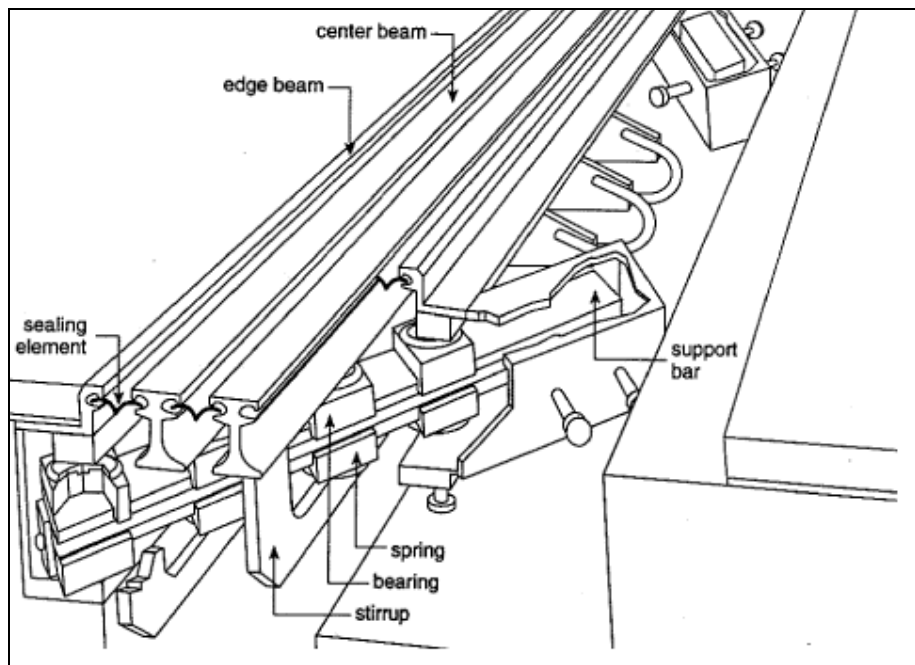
Cut-Away View of a “Swivel Joint,” i.e., a Special Type of Single-Support-Bar (SSB) Modular Bridge Joint System (MBJS) with a Swiveling Single Support Bar.
